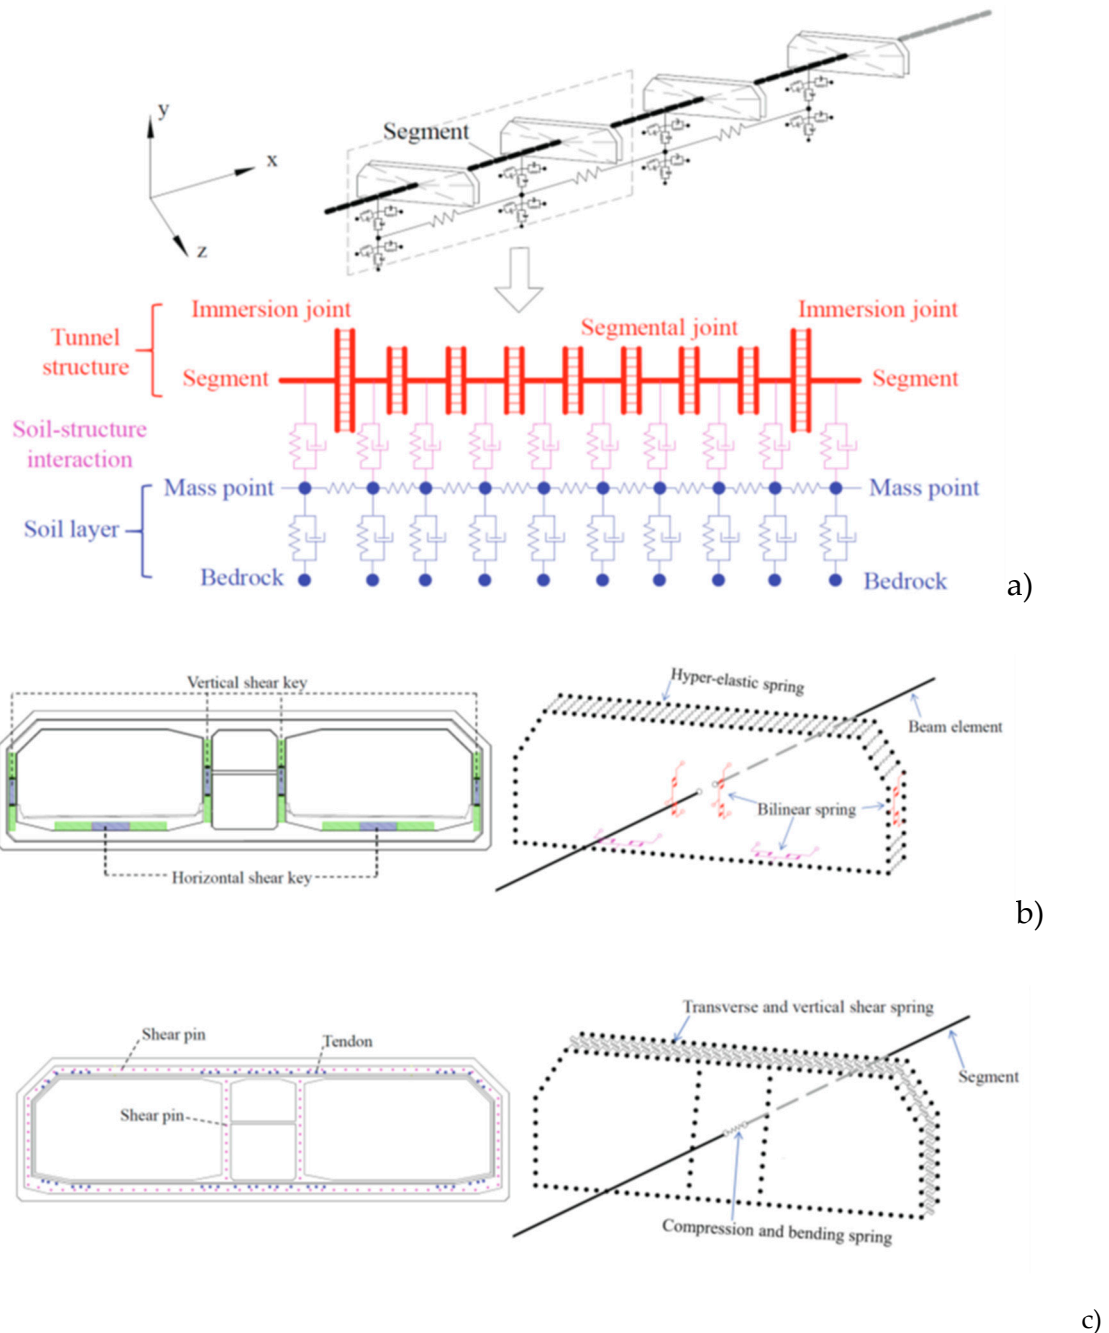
Spatial model of the immersed tunnel - foundation system: a) global model; b) immersion joint; c) segment joint (reproduced with permission from Zhang et al. [14]).
